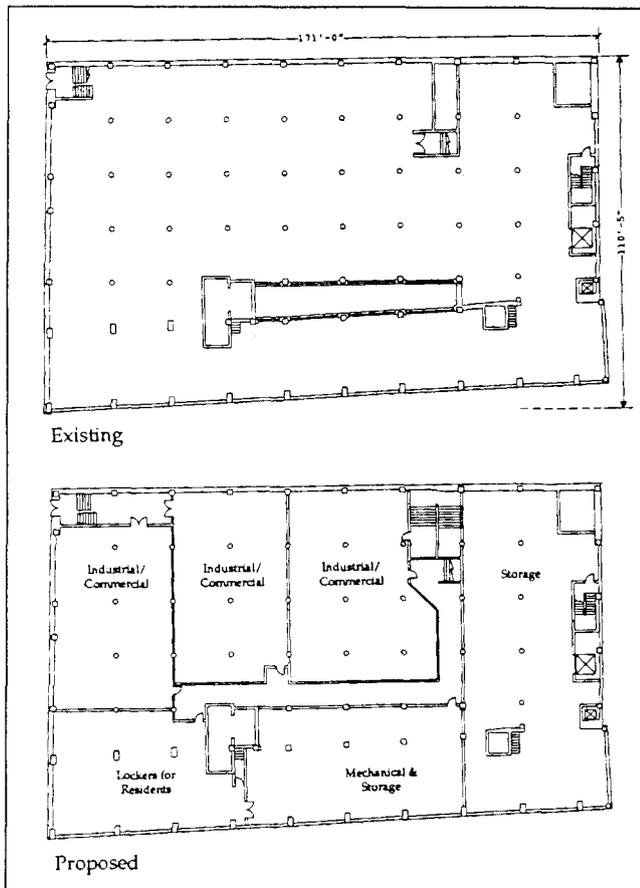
Lower Level of Mayor Building—Existing (Top) and Proposed (Bottom) Plans
